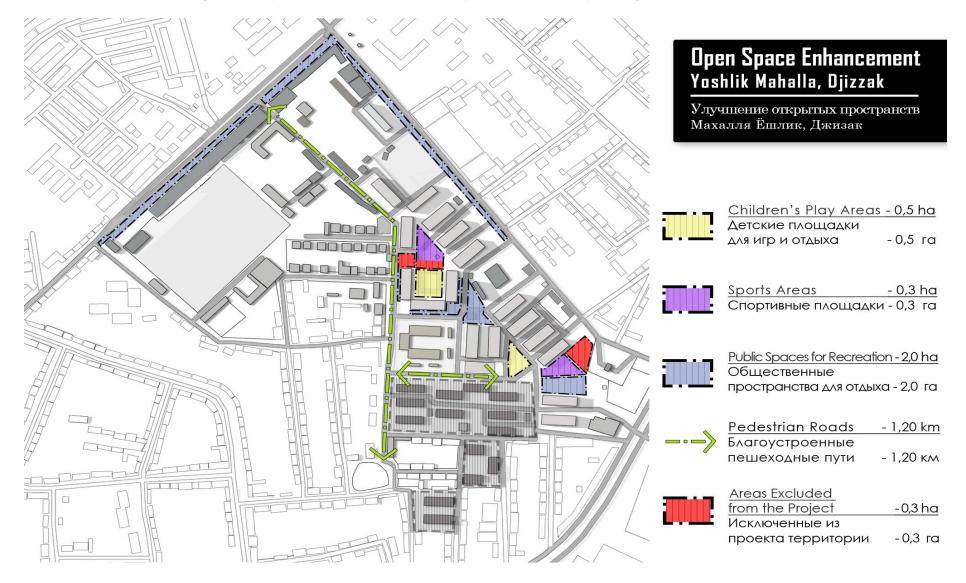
Open space locations and improvement concept design in Yoshlik mahalla
